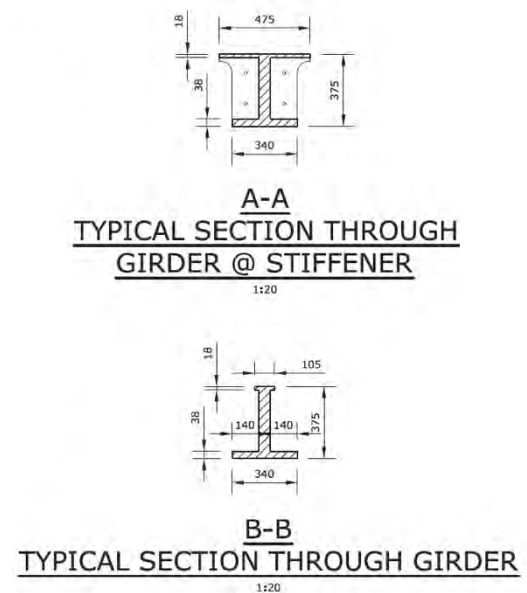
2013 MLM Consulting Engineers Ltd sectional drawings through the casting.
